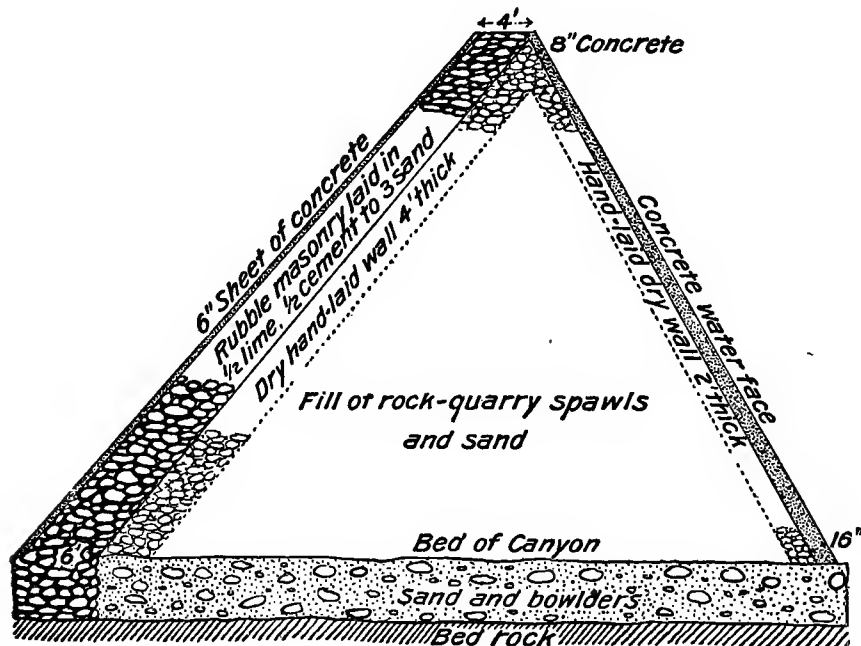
SKETCH OF RECONSTRUCTION OF CHATSWORTH PARK ROCK-FILL DAM.
